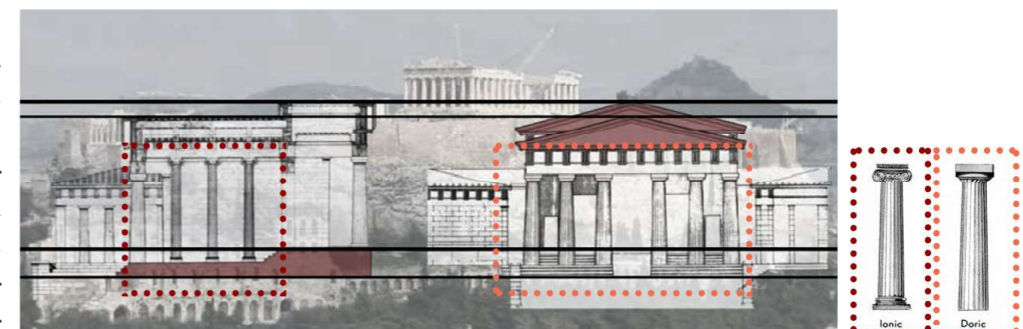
Above; Elevation of the Propylaea and use of columns (Author:2018)
